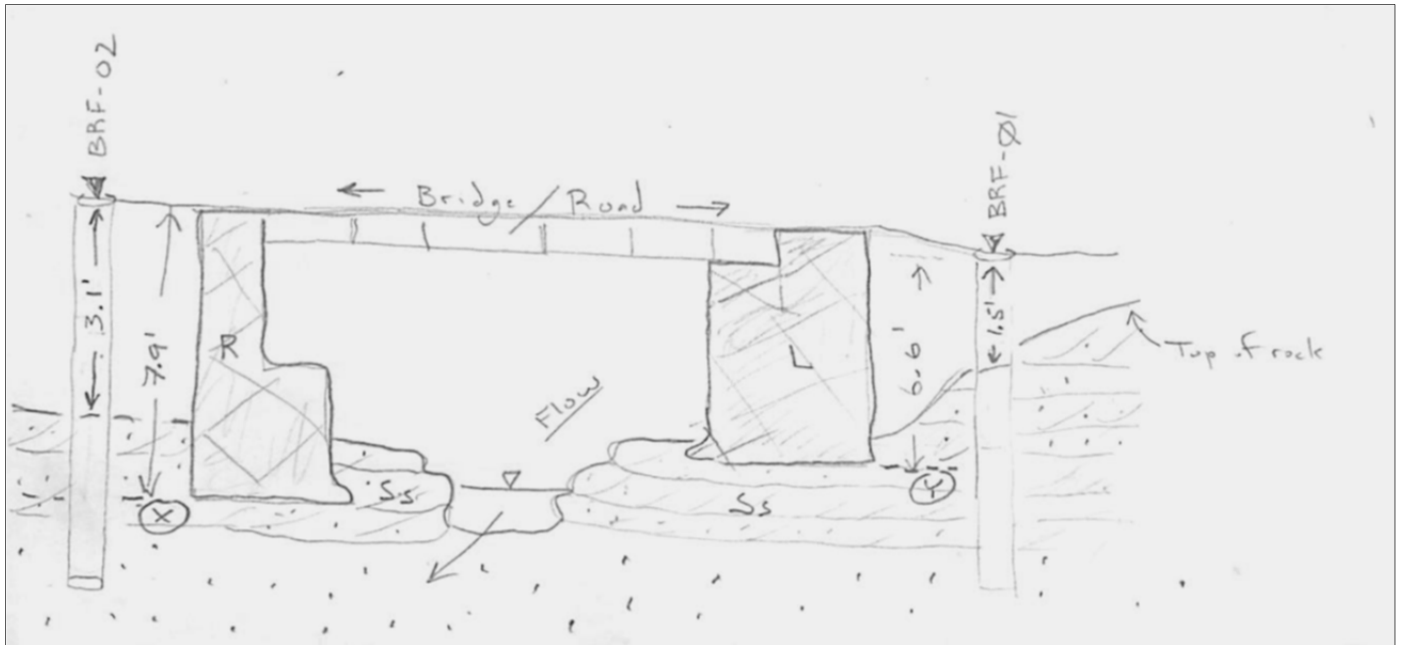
Field sketch of Bridge Fork Bridge, looking upstream.
